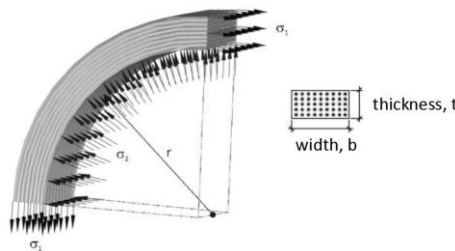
Average stresses acting on a bent portion of reinforcement embedded in concrete
